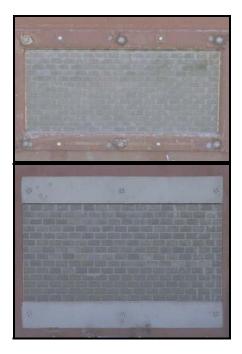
¹/₄-scale CMU wall steel and concrete frame.
